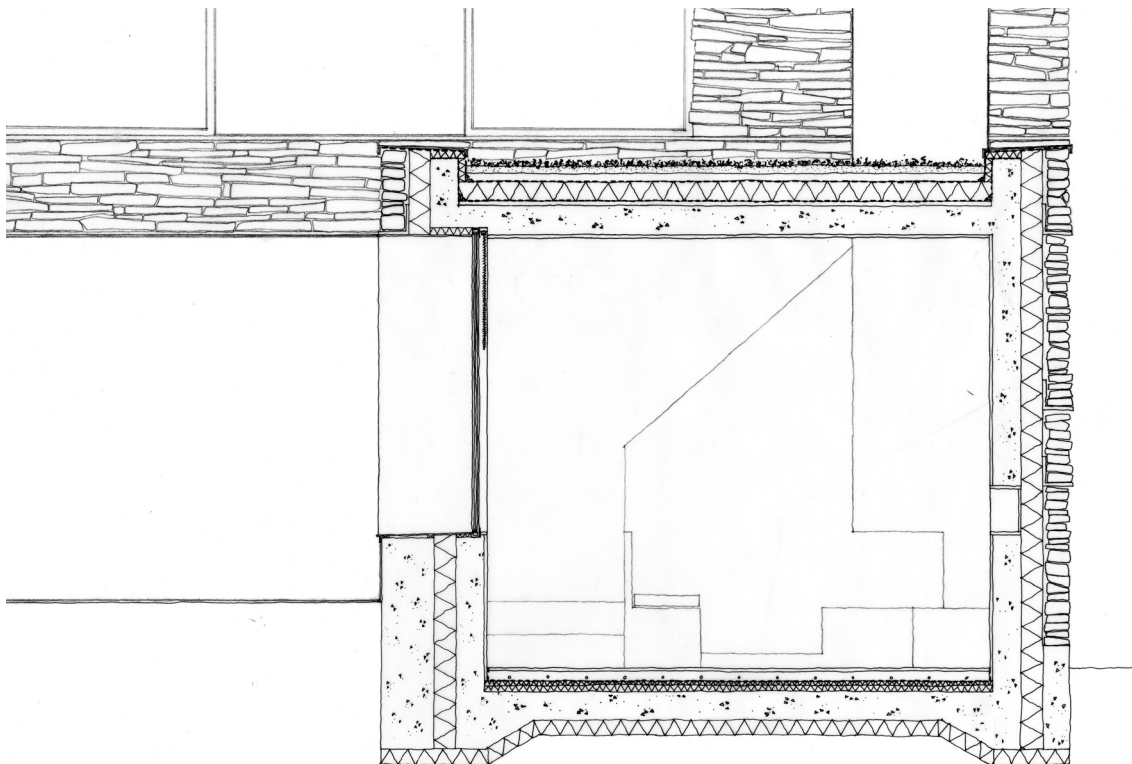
An attempt at detailing construction of the 3 bed house type with an in situ concrete structure and a dry stone wall cladding. The method of building became complex in compensating for cold bridging.
